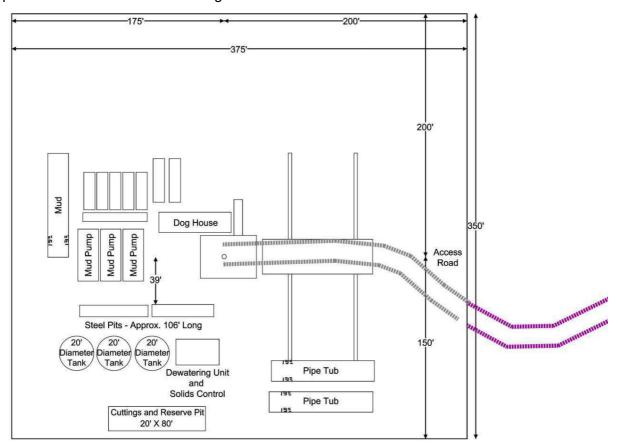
The plan of the LCW2 drill pad layout (not to scale).
